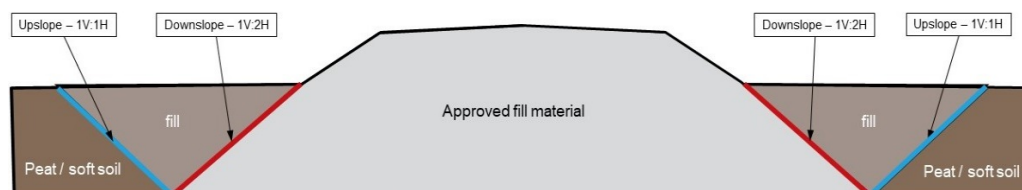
Assumed Soft Soil Excavate and Replace Section
